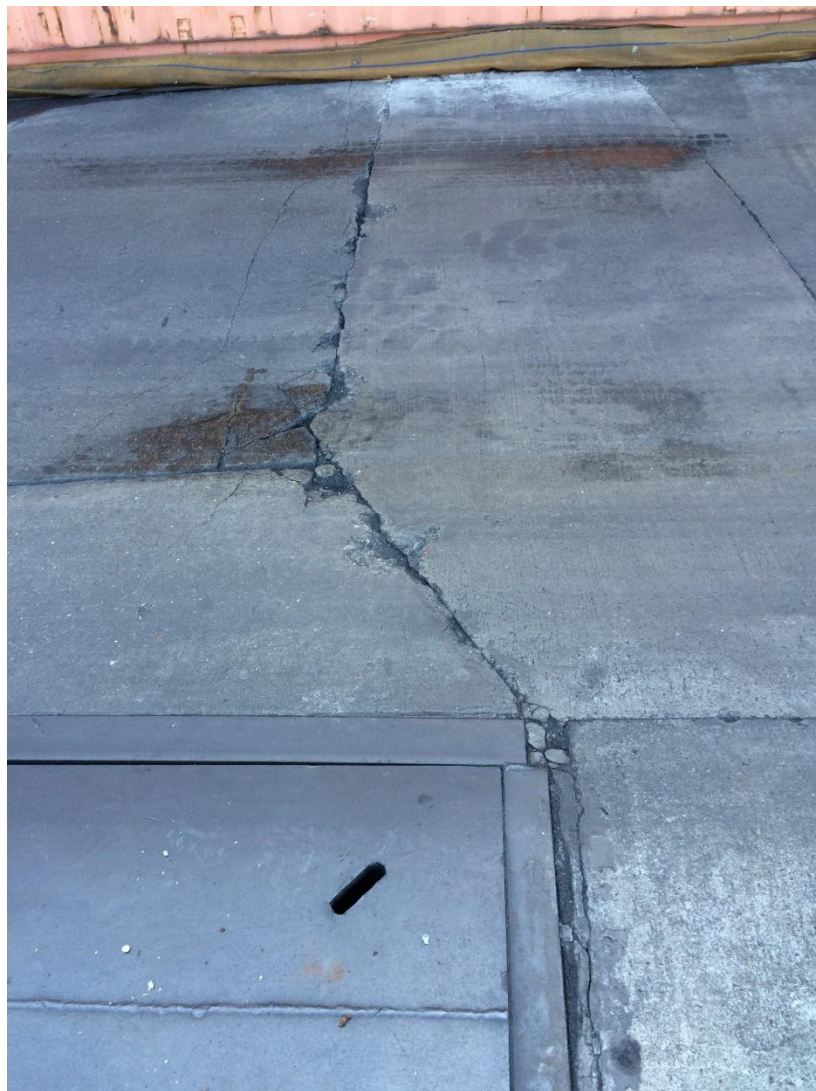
Looking east from corner of interceptor SW-4: crack extending east with sealant and concrete wearing at seams.
